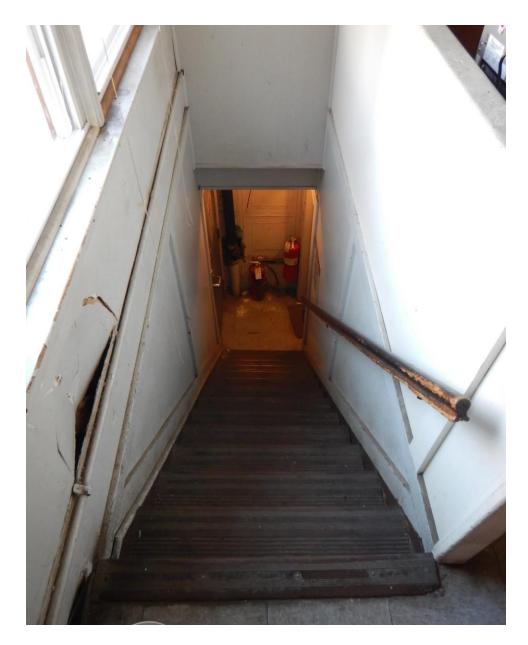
STAIRCASE TO SECOND FLOOR FACING NORTH
